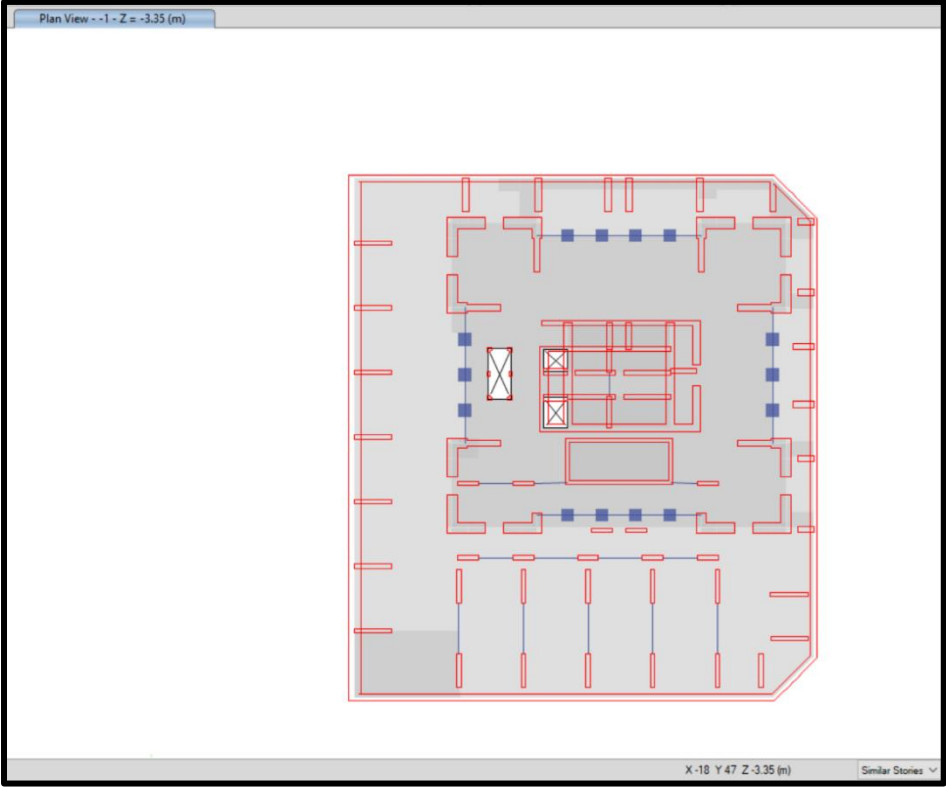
1st Basement Floor Plan with (Similar Stories) Option Activated
